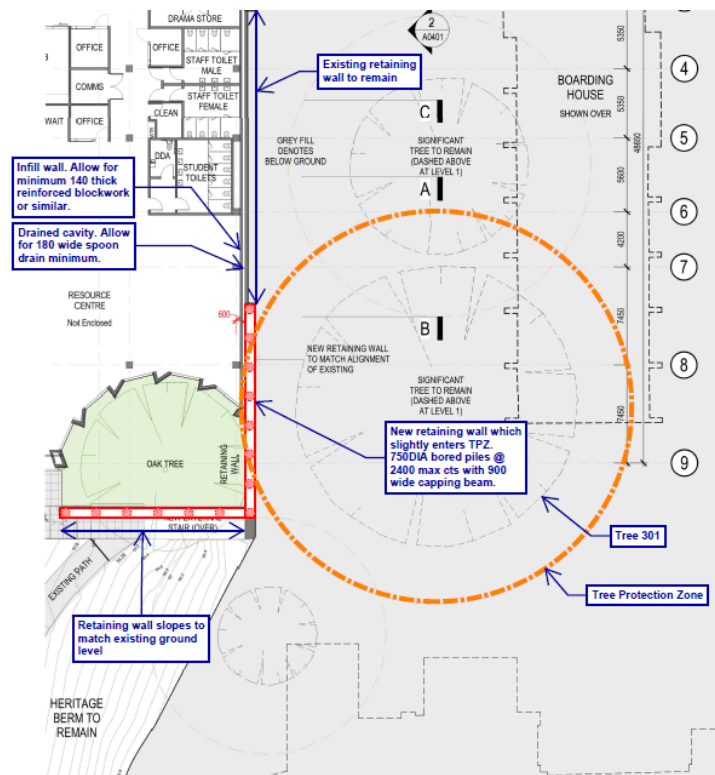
Excerpt from retaining wall detail (PS124859-20210719). (Client, July 2021).
